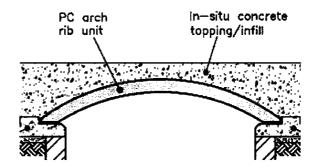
PC Arch Rib Unit with In-situ Concrete Topping
